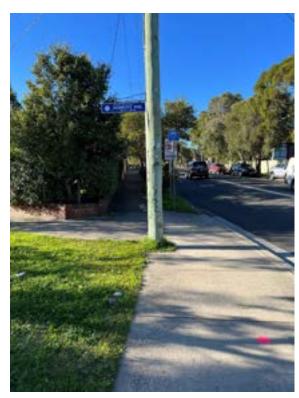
View south along Waratah Street – existing concrete footpaths on the eastern side of the road
